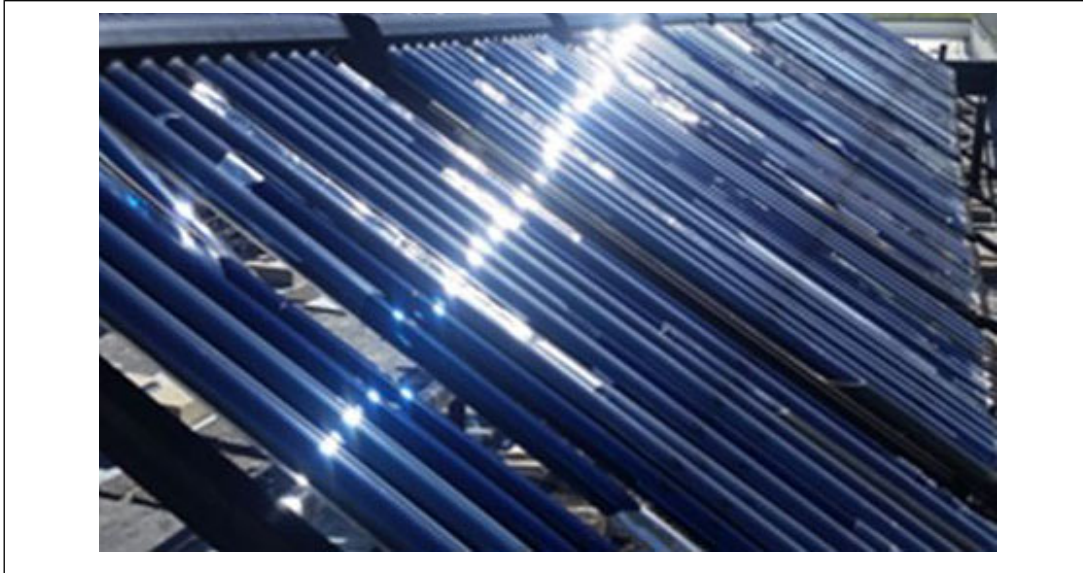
Glass tube solar heat exchanger damaged by 1.5 in. (38 mm) diameter hail
